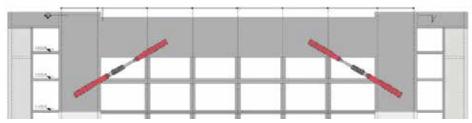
Prestressed concrete at top of belt truss beam, with diagonal steel reinforcements shown.
